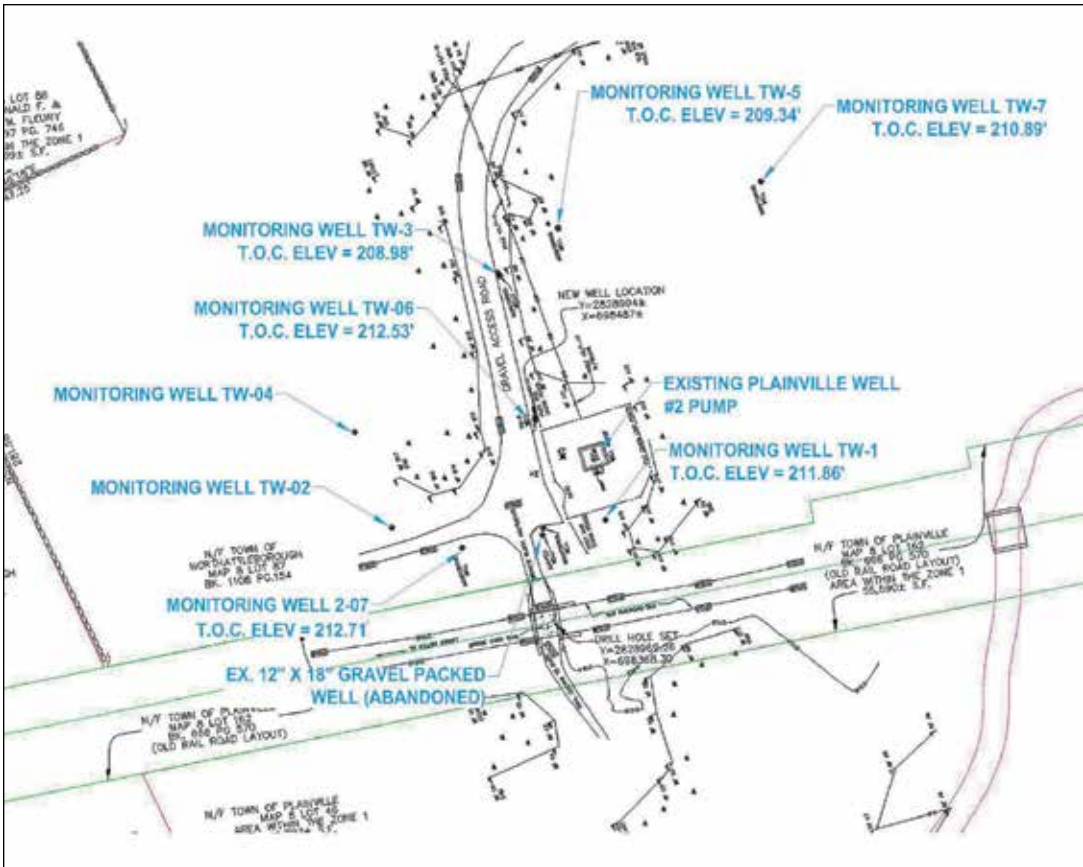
Plainville Well No.2 Site Plan with Test Well Locations
